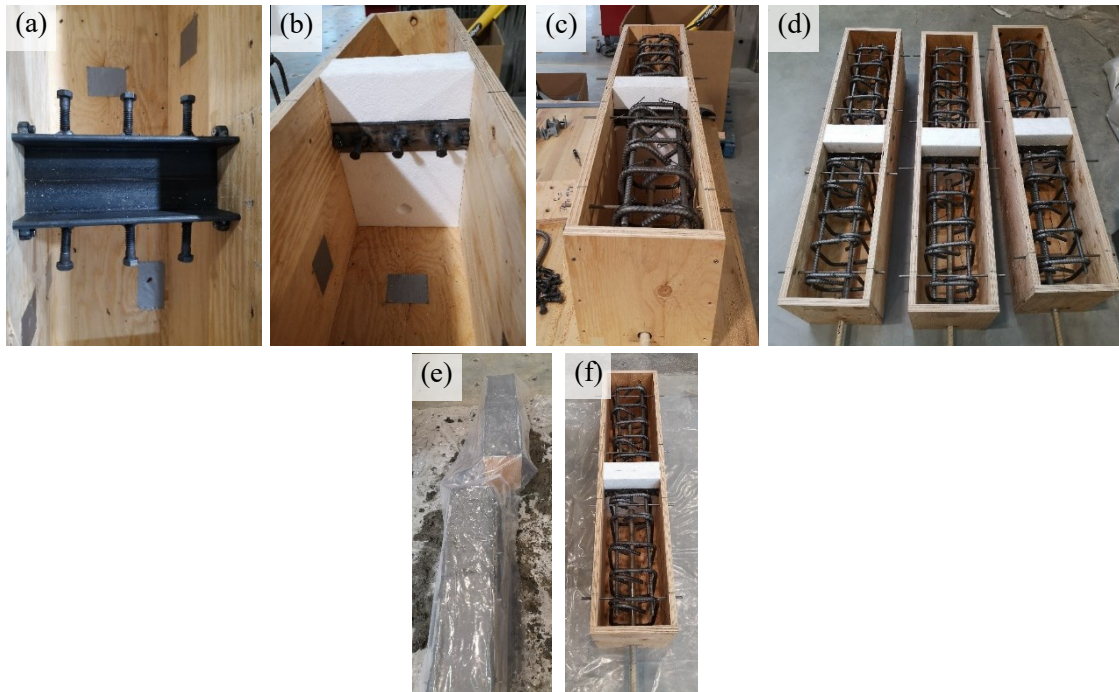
(a) connection of lateral plywood boards through steel plates, (b) Styrofoam positioning inside formwork, (c) typical location and mounting system for rebar cages assembled, (d) longitudinal bars placed along formwork, I RILEM beams during curing process, and (f) CE beam series with longitudinal acrylic tube.
